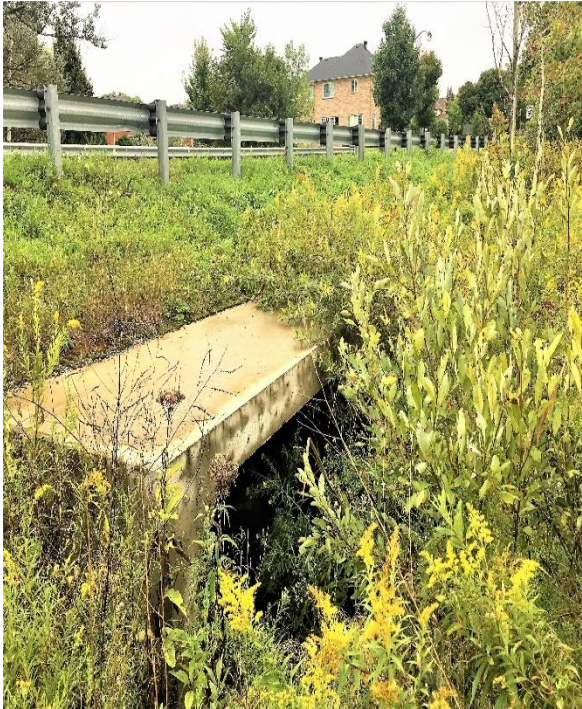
View of Box Culvert at east side of the property (looking southeast)
